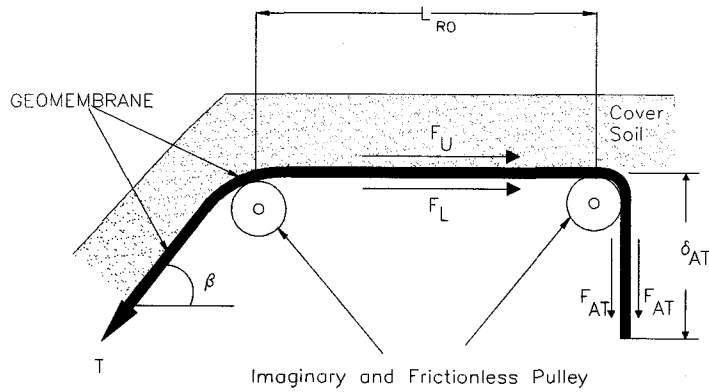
Cross Section of Geomembrane runout Section with Anchor Trench (After Koerner, 1994).
